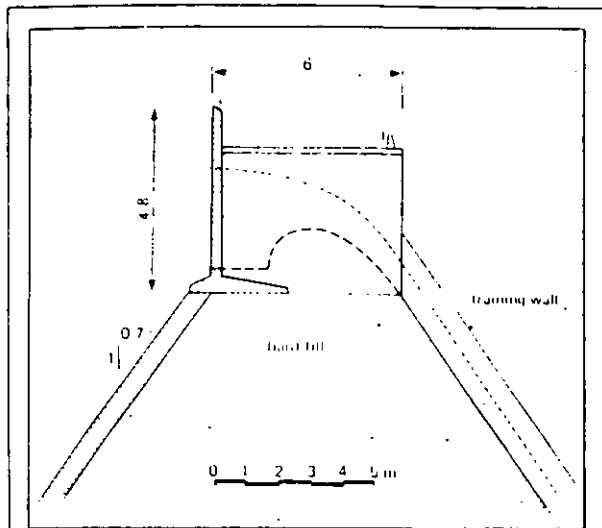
Typical FSHD crest, showing a free-flow spillway arrangement.
